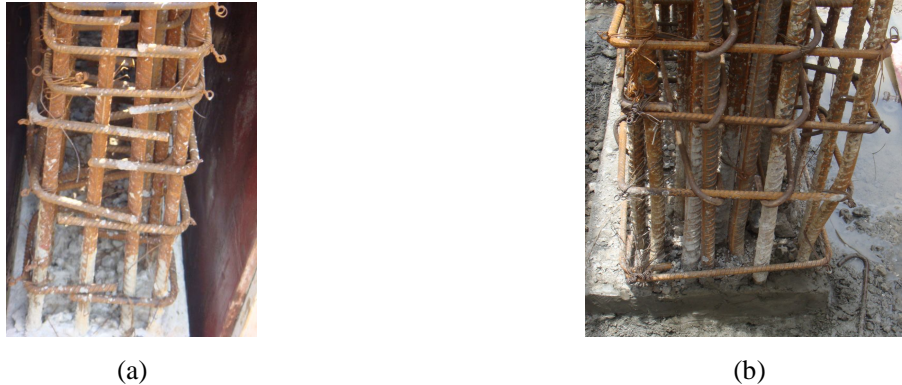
Faulty reinforcement detailing practice, (a) 90° hooks, (b) Improper and inadequate confining stirrups in columns
